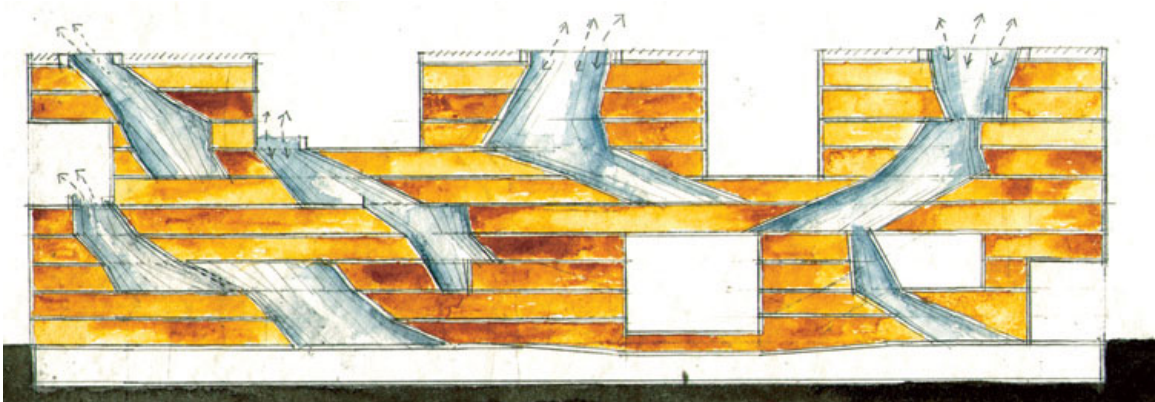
Concept sketch for Simmons Hall, Massachusetts Institute of Technology by Steven Holl Architects
